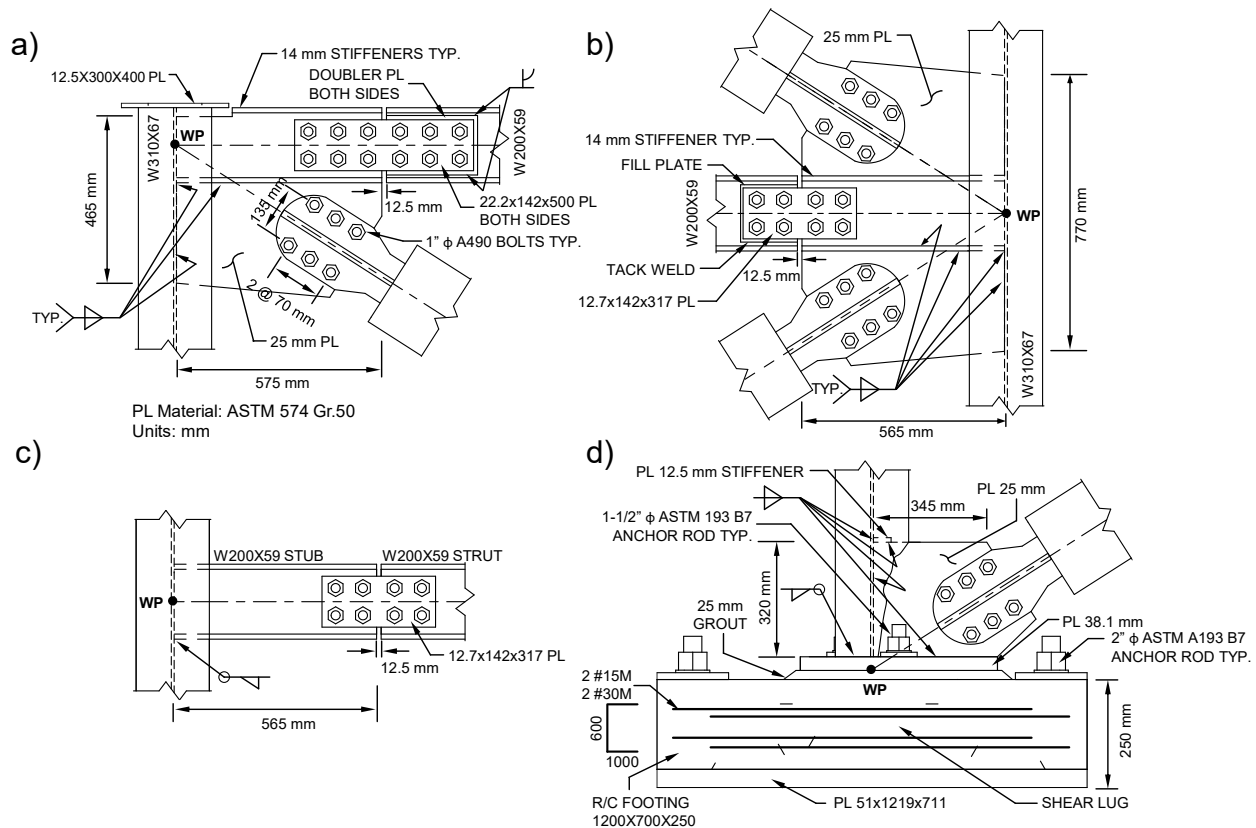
Test specimen connection details: a) BRB-to-beam/column connection at the roof level; b) BRB-to-strut/column connection at the tier level; c) strut-to-column splice connection; d) column base connection.
